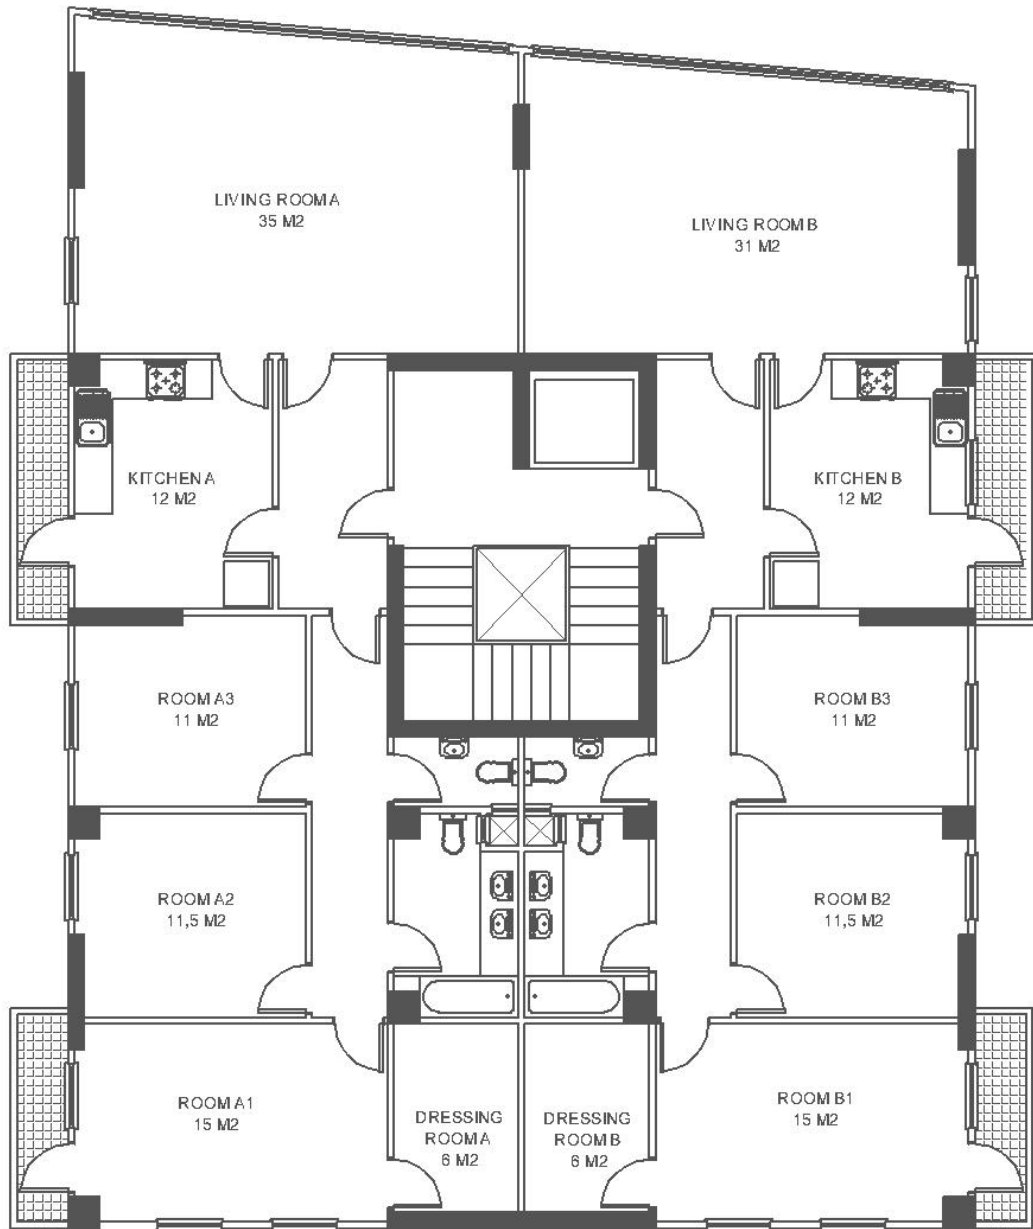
Architectural Plan of Model-1 with Regular Structural System
